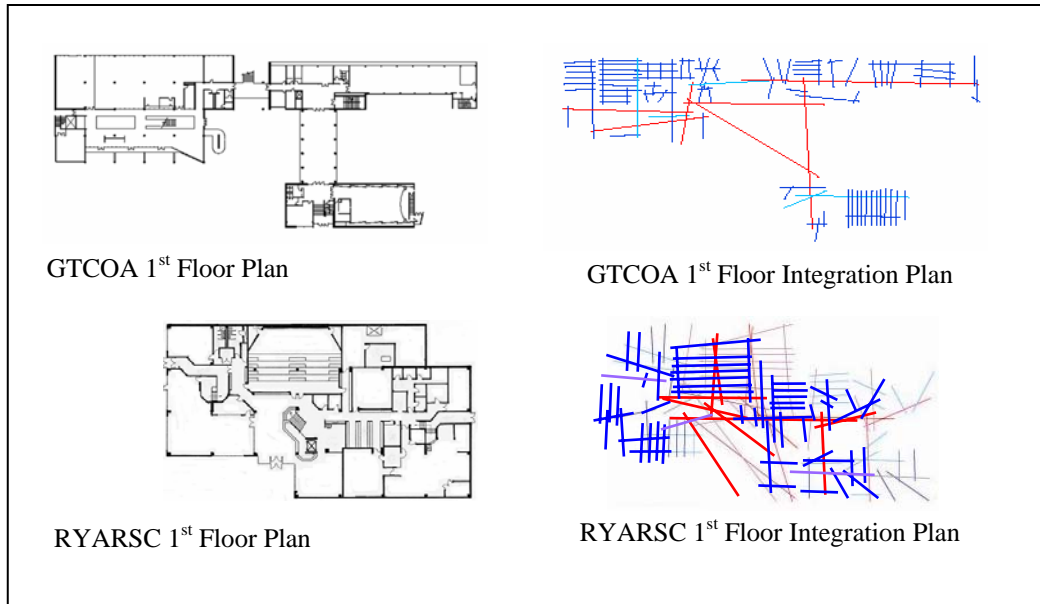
GTCOA and RYARSC Building and Integration Plans
